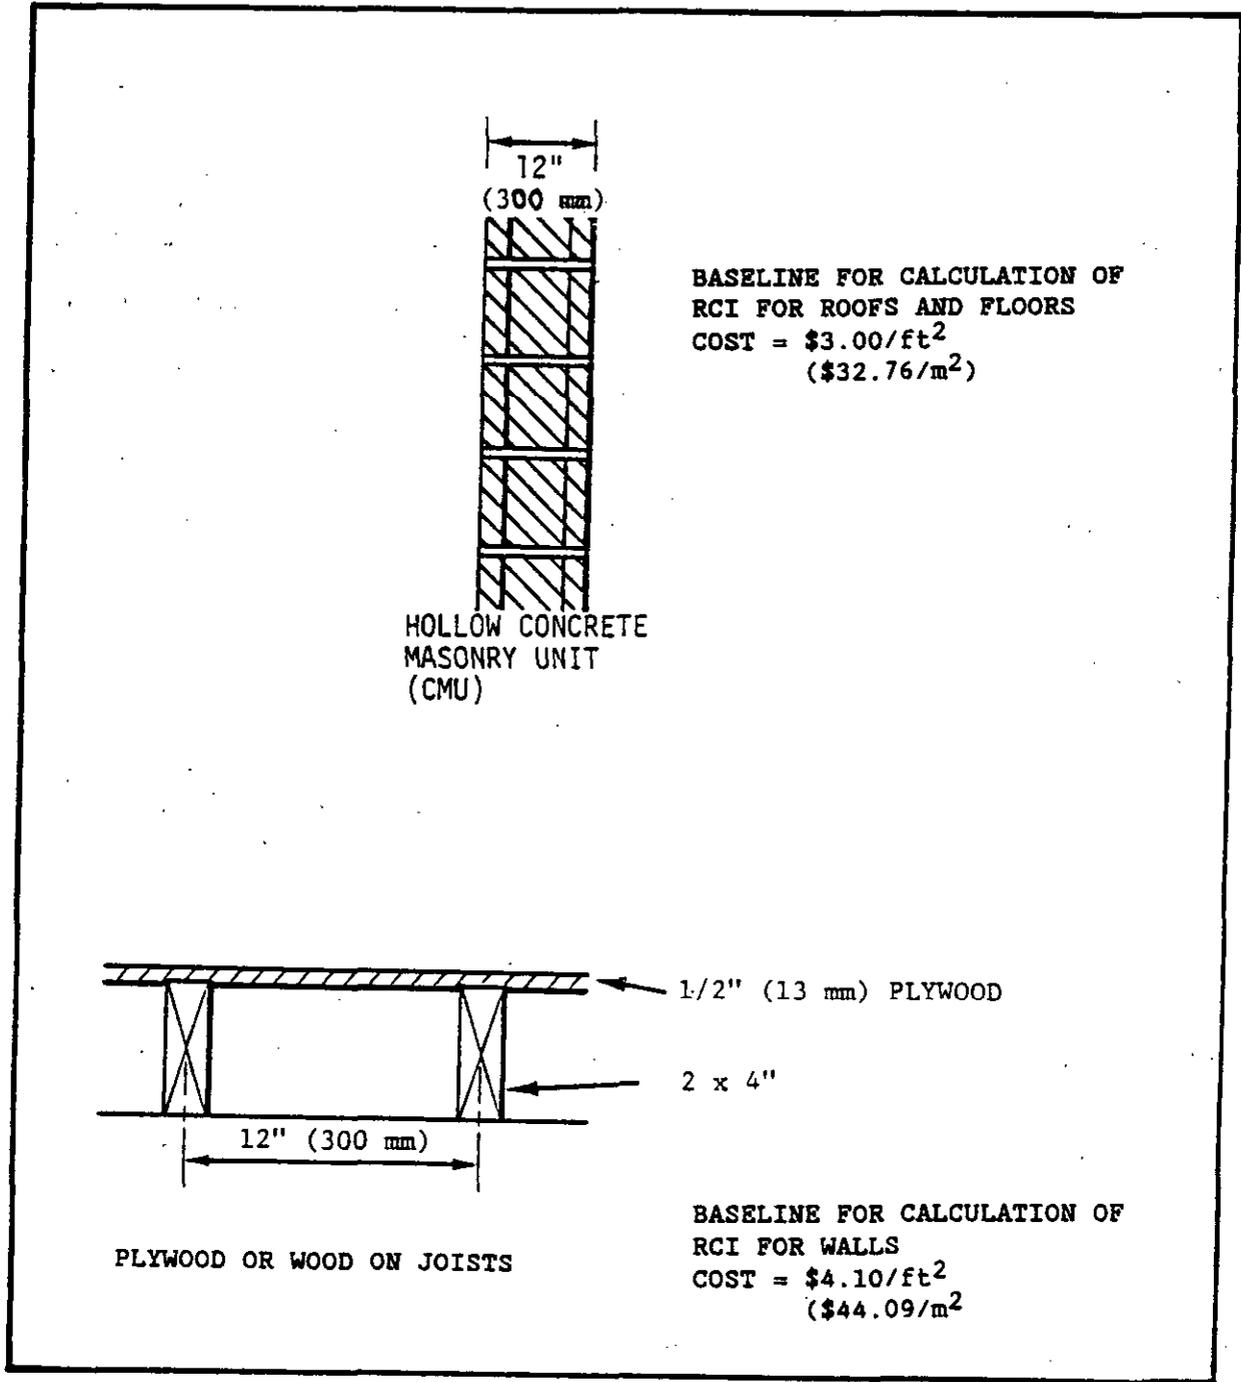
Construction options used for calculation of RCI values for walls, roofs, and floors.
